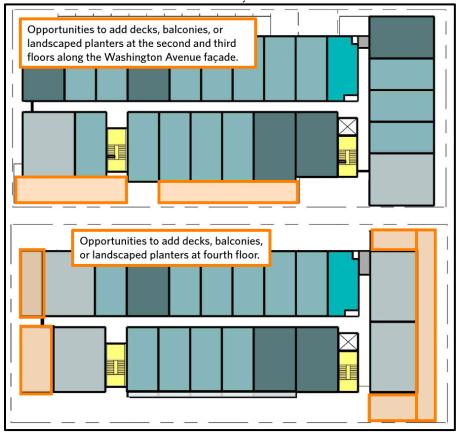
Opportunities to Add Decks, Balconies, or Landscaped Planters at Upper Floors
